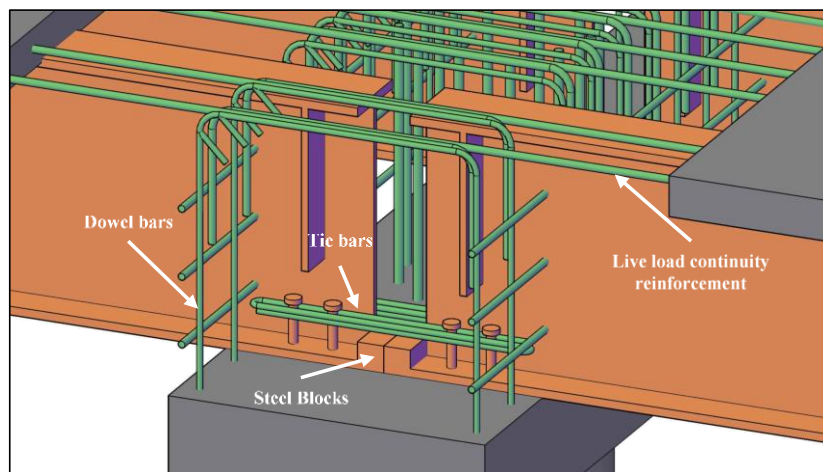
Current SDCL connection detail using normal concrete diaphragm.
